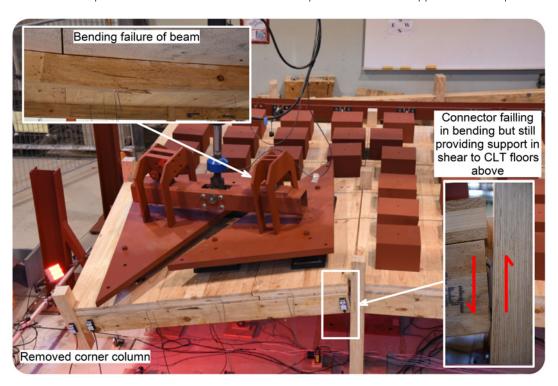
Timber post-and-beam substructure tested under a corner column removal scenario.
